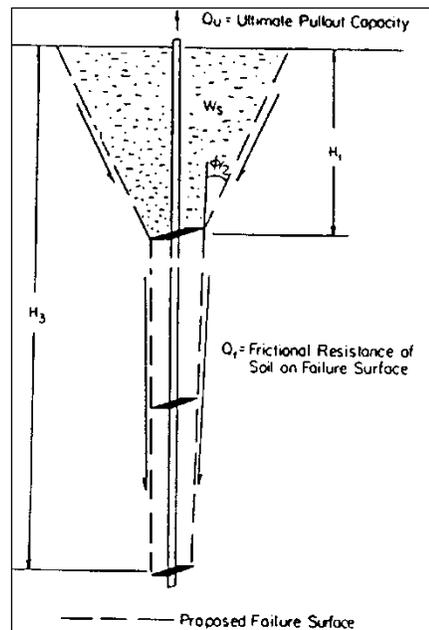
Failure Surface of Shallow Helical Anchor in Sand (Mitsch and Clemence, 1985)
